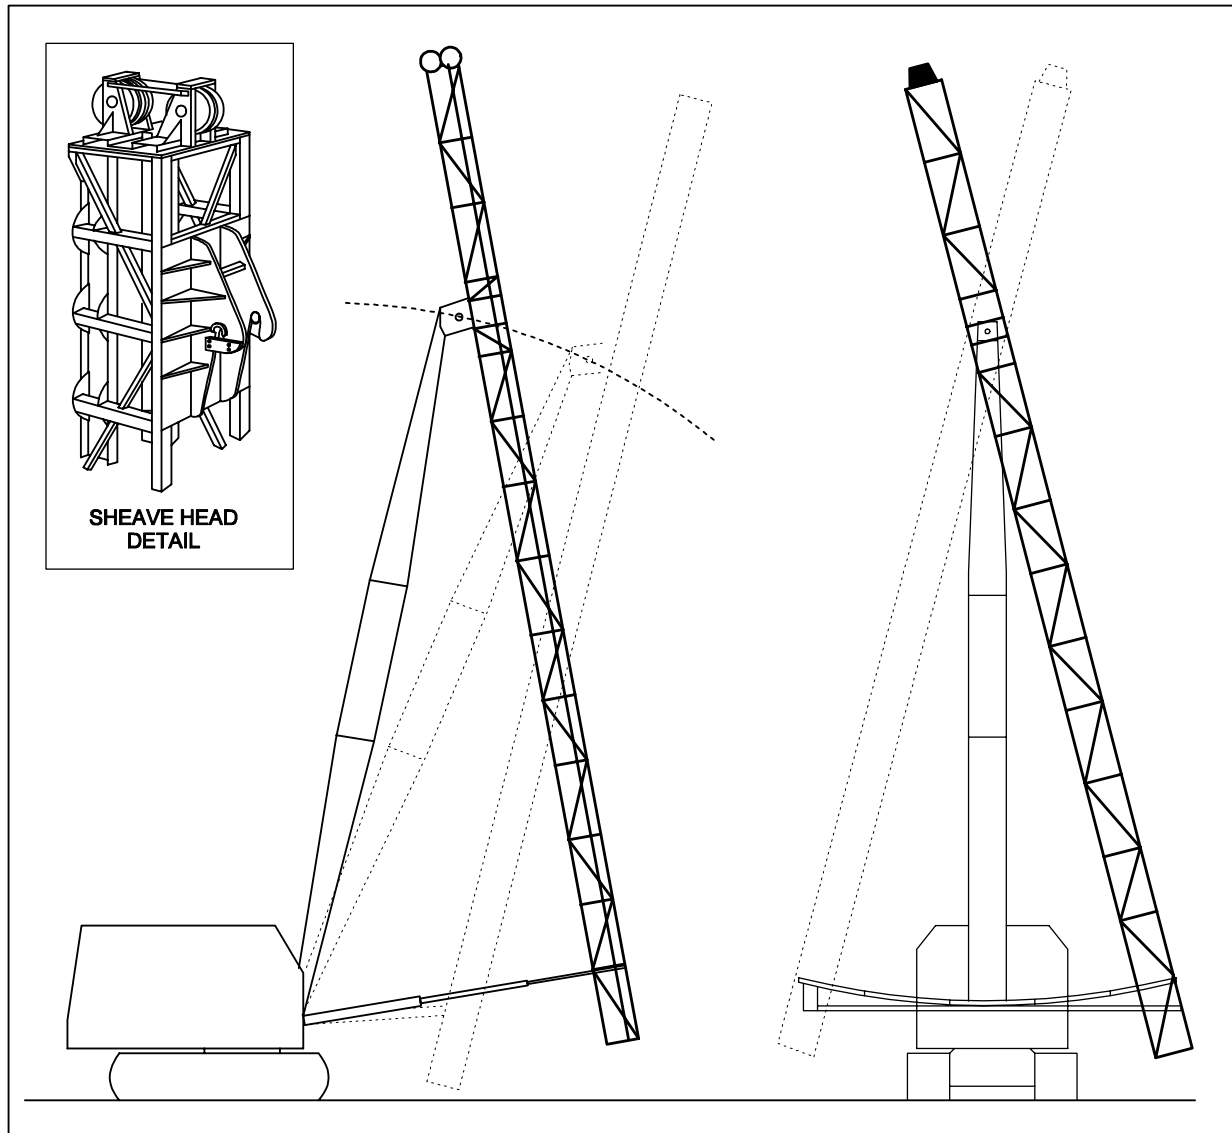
McKiernan-Terry 4-Way Batter Leads
